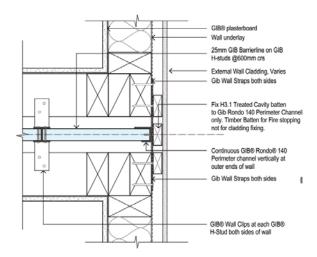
Intertenancy wall with cavity, edge-sealed at wall due to building paper, no edge insulation
